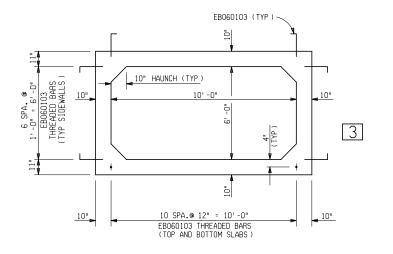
DETAIL SHOWING CONNECTING COLLAR STEEL NOTE: COLLAR IS POUR A
